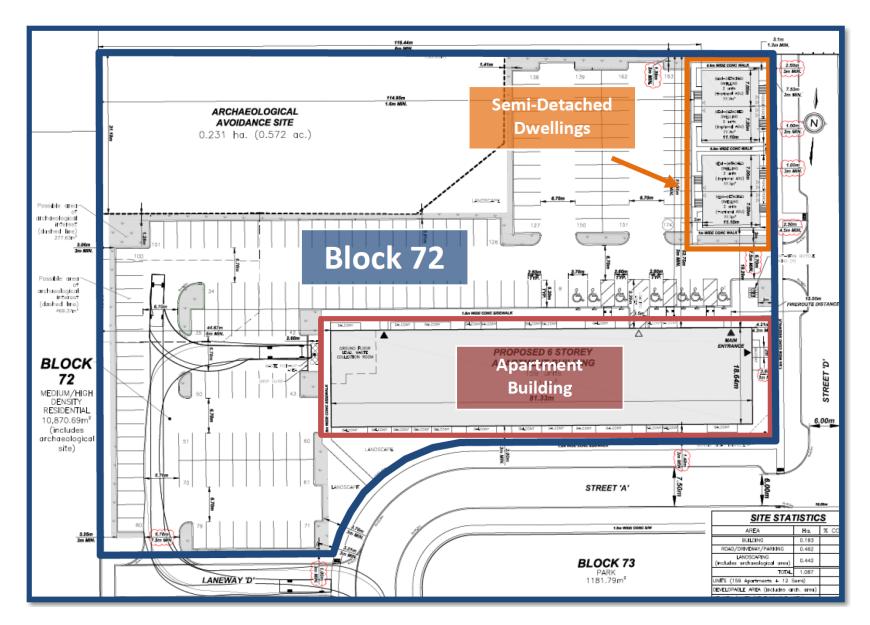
(above): Proposed Site Plan for the Subject Lands and Location of Proposed Variances
